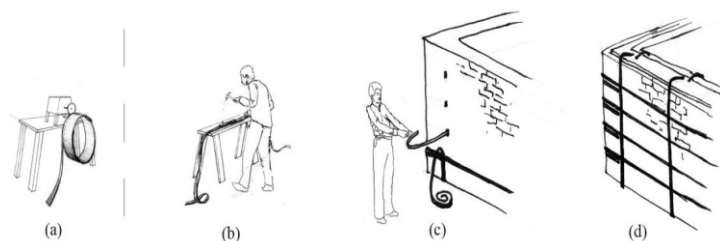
Steps in the process of reinforcing an adobe house with tyre straps. Step (a) is performed in a workshop or factory and (b) to (d) on site. (Courtesy Matthew French)
